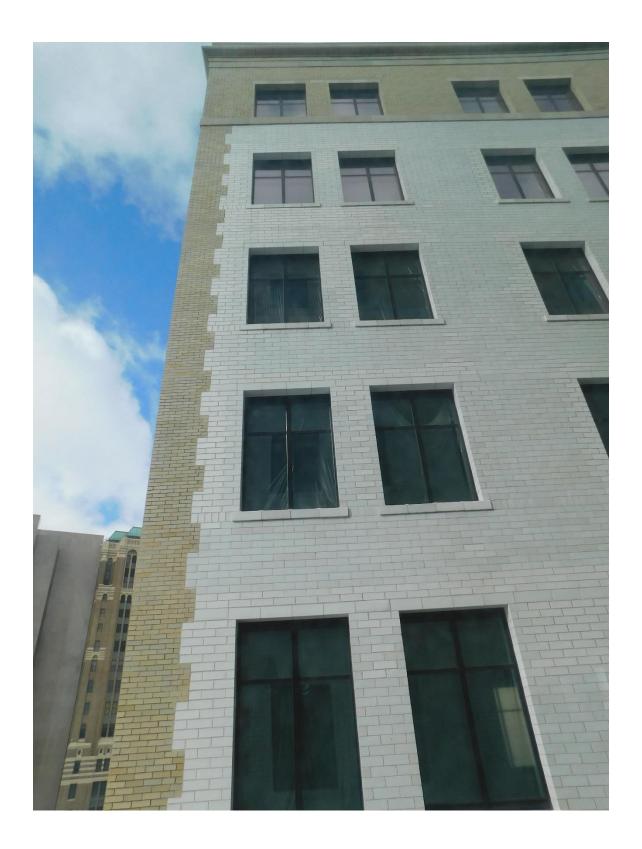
Exterior, Looking West, South Lightwell. 2/27/20
